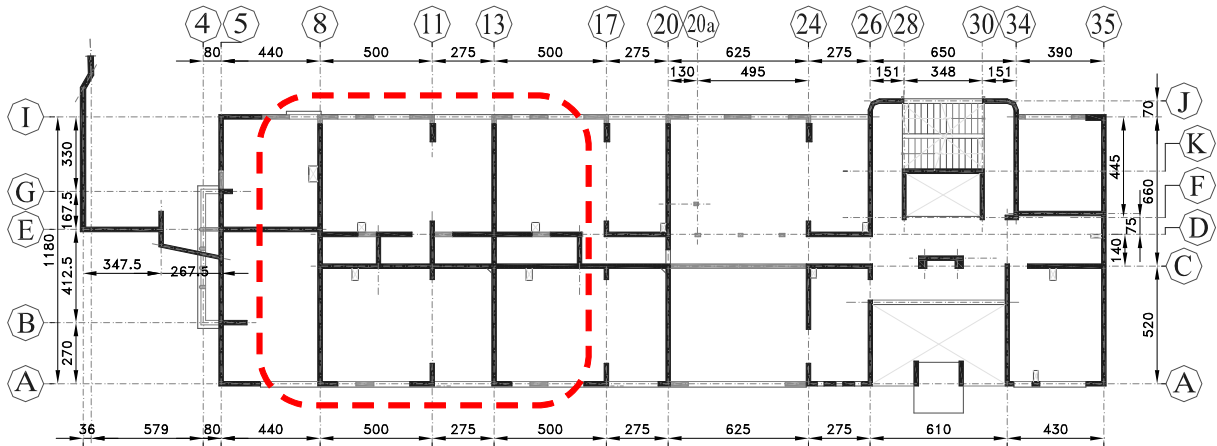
Alto Rio building first-floor plan. Dashed line encloses portion of building modeled in the nonlinear static analysis (Unit: cm) (Note: 1 cm = 0.3937 in)
